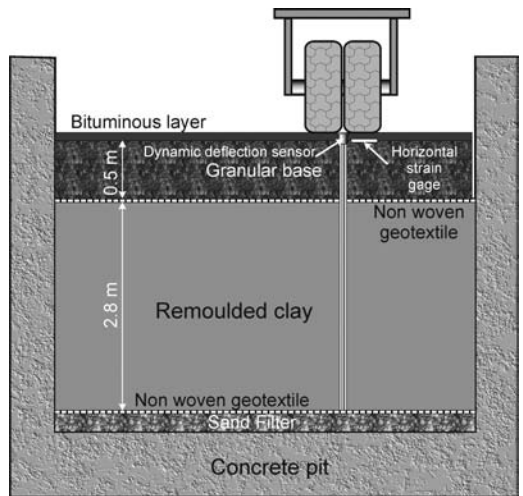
Schematic drawing of the concrete pit and pavement structure.
